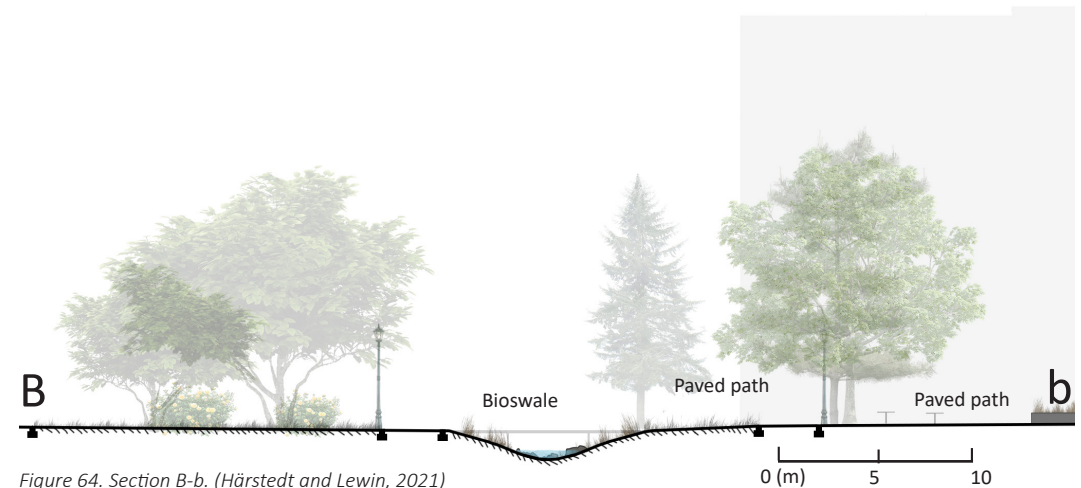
Section B-b. (Härstedt and Lewin, 2021)
